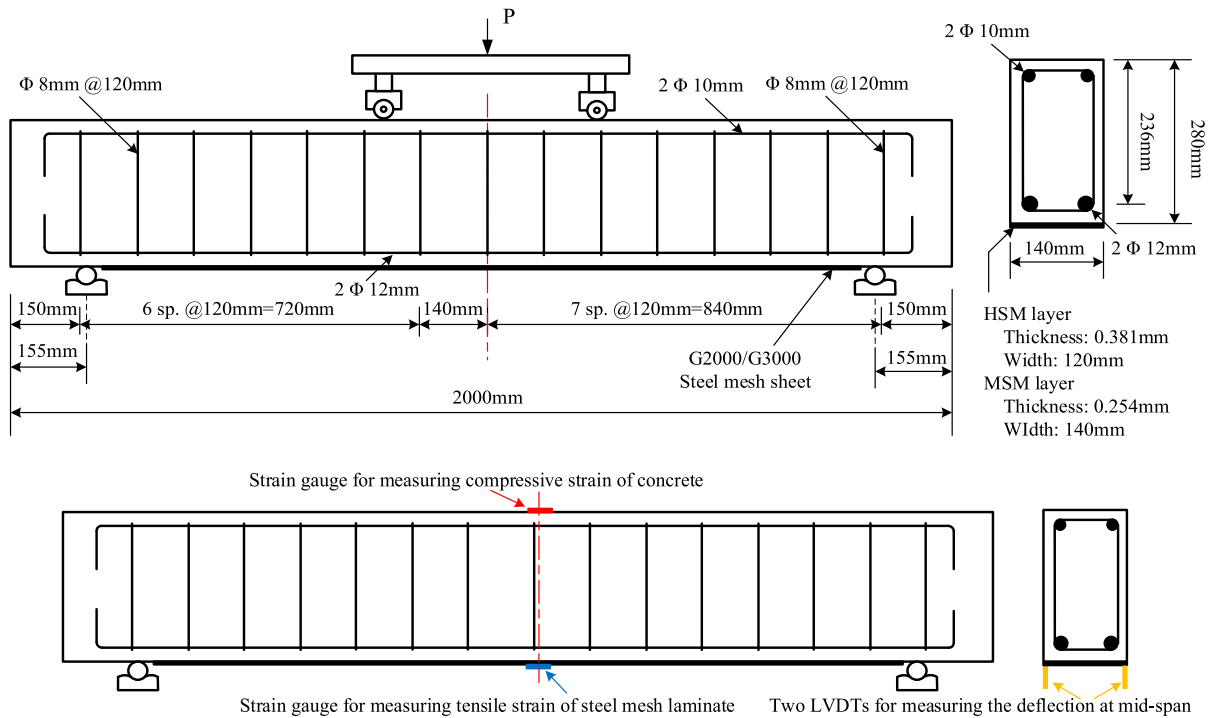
Size dimensions of the concrete beam and steel mesh laminate.
